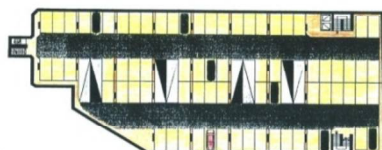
Basement floor plan (-3) and (-4) of Second Underground Garage under Tahrir Square.
